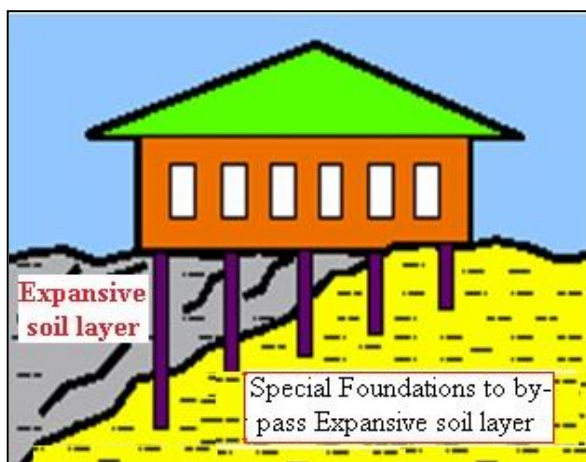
Special foundation in expansive soils against failures in expansive soils
